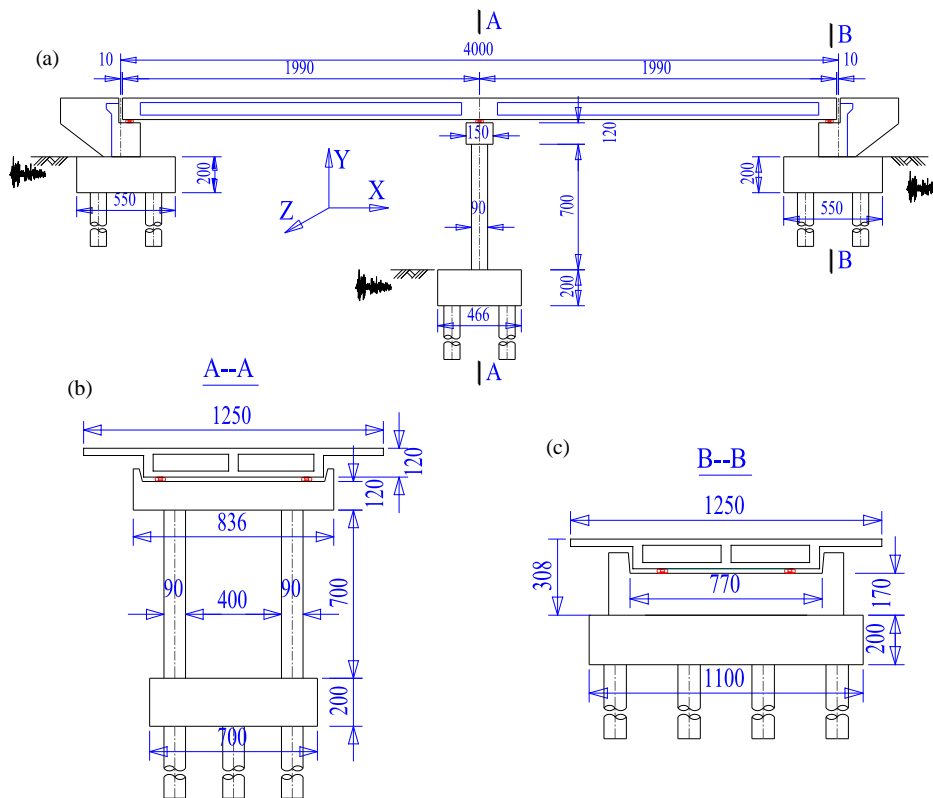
(a) Configuration for the investigated continuous RC bridge (unit: cm), (b) elevation view, and (c) section view of the bridge
